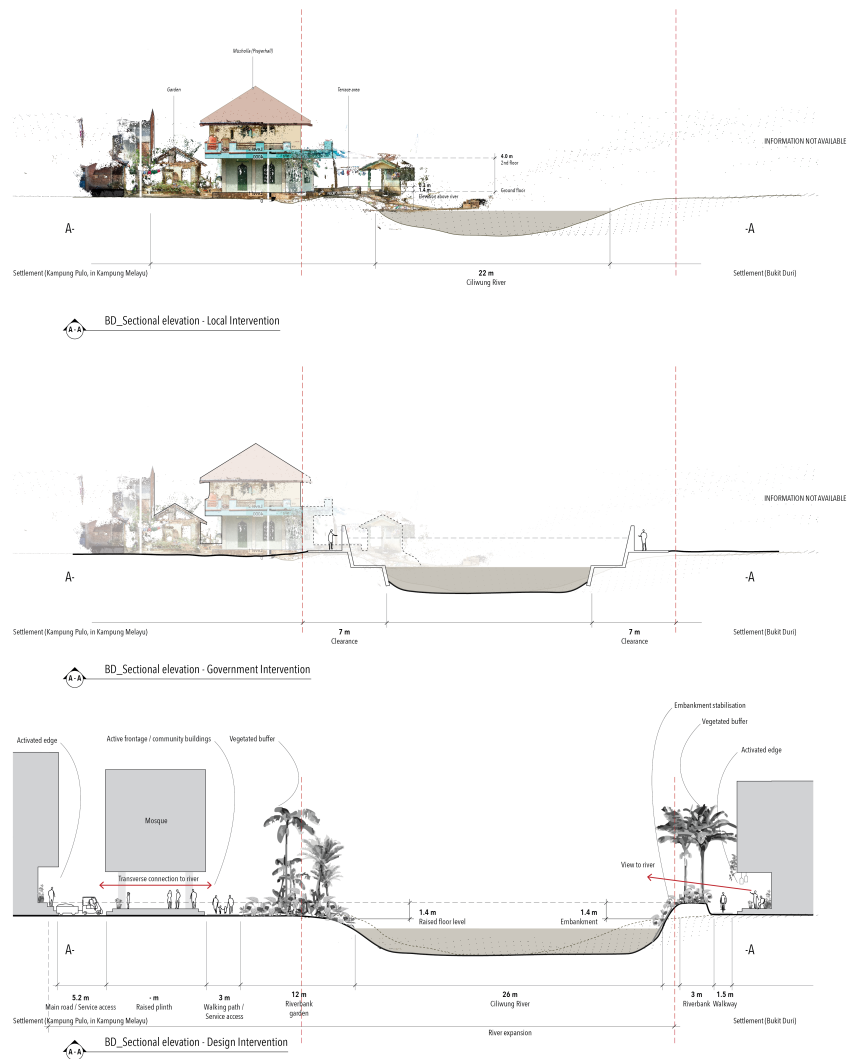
The design tactic for the left bank draws on cross-sections F1 and F9, providing river access, a garden of resilient plant species and transverse connections between the neighbourhood and river's edge. Buildings proximal to the river's edge incorporate coping mechanisms, with plinths and multiple levels. The design tactic for the right bank draws on cross-section F11, strengthening the flood resilience of the low-lying area with a vegetated berm. Both configurations include provision of access for pedestrians and vehicles. The river is widened and deepened.
